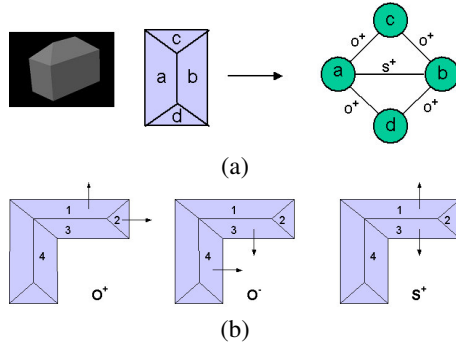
(a) A simple roof shape and the corresponding roof-topology graph. (b) Relationships between slopes of adjacent planar roof segments.
